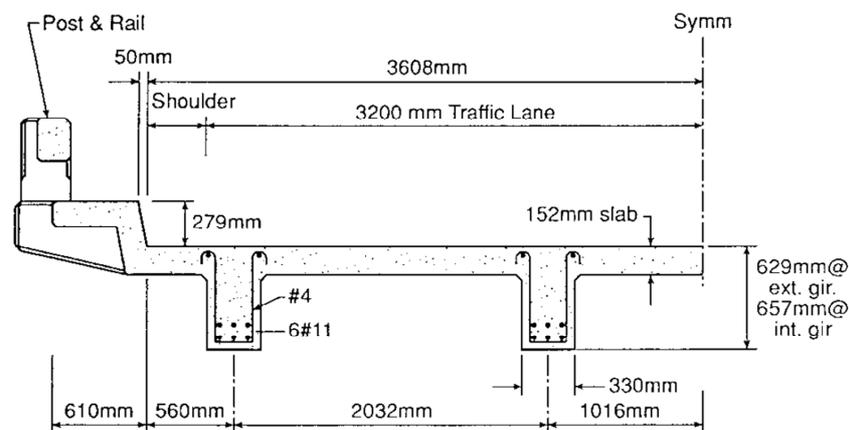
Bridge cross section with girder details <sup>[46]</sup>
